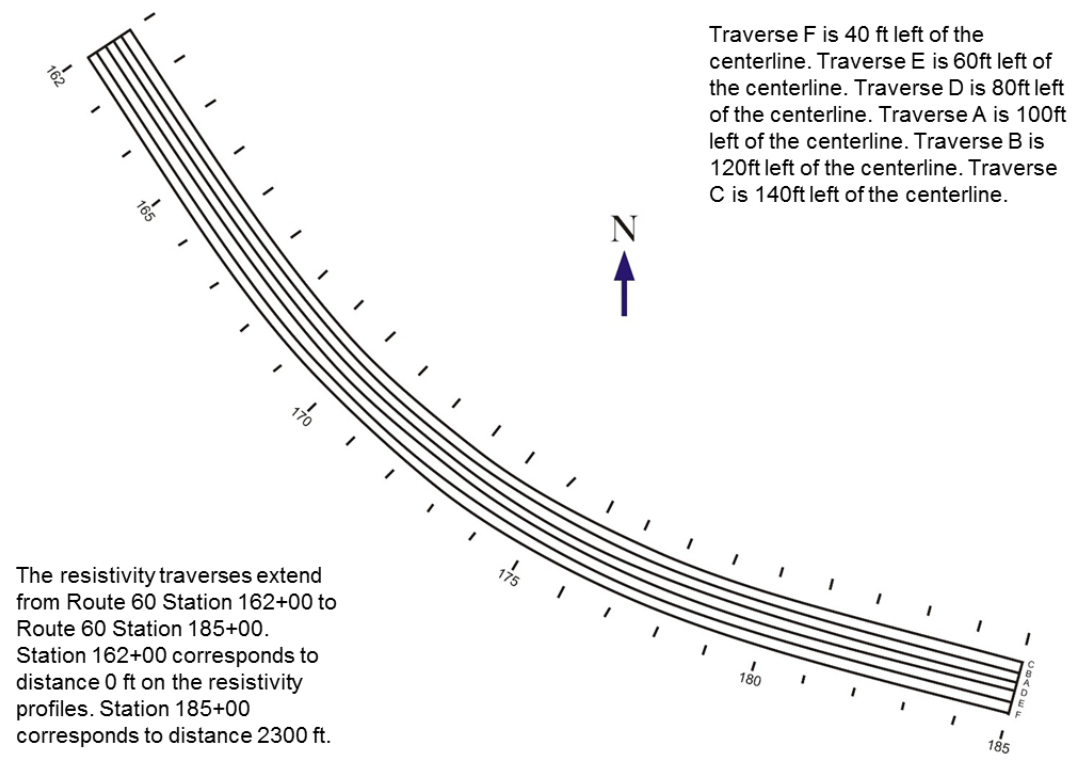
Layout of ERT traverses A, B, C, D, E, F at site #3 [Adopted from 61]
